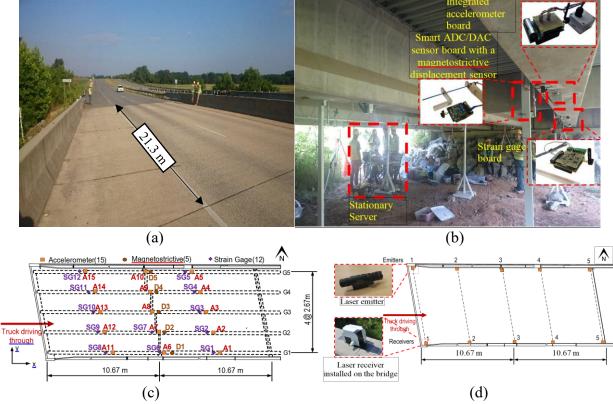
Field instruemtnation (a) Bridge Over View (b) Bridge Instruemntation (c) Location of the instrumentation on the bridge girders (d) laser emitters and recivers.
